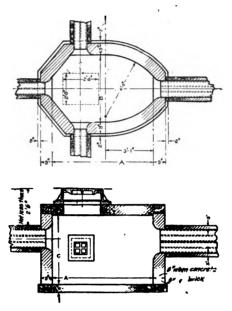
Vault Size 9, to be Used on Conduit Runs when Intersected.
